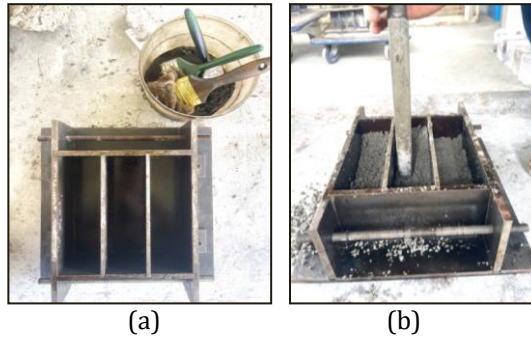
Process placing and compacting (a) Mould set and coated mould with oil; (b) Placed and compacted fresh mixture using a tamping rod
